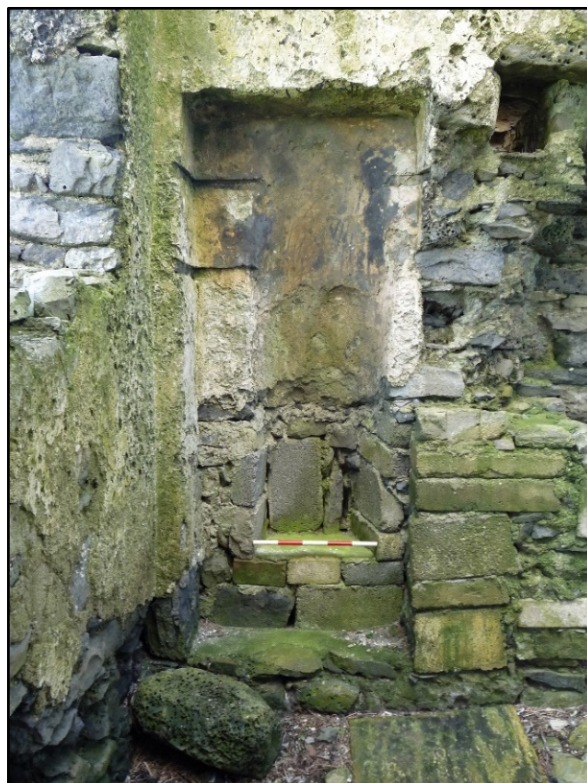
The west alcove at ground floor level of the internal south wall face, showing the impression of two shelves in the render and the curved seat built into the bottom of the alcove.
